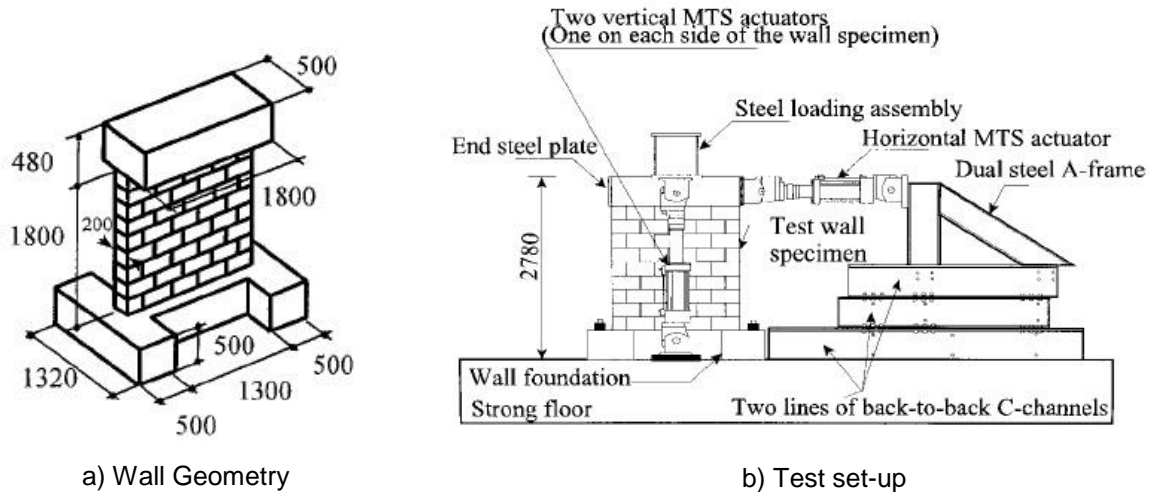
Geometry and test setup used for unreinforced wall tests
